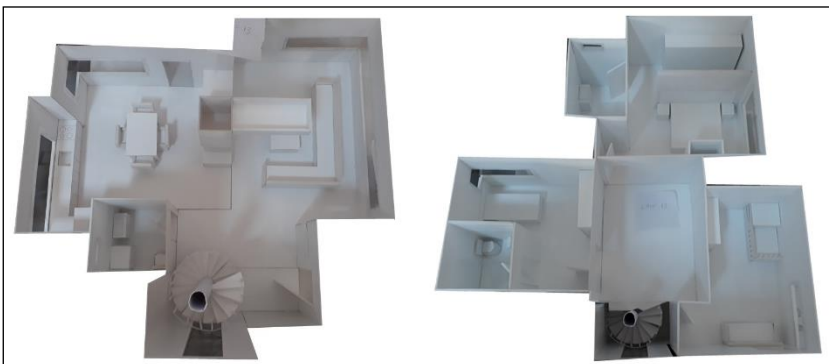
Top views of the example house for a couple with children and babysitter – Ground floor (left) and first floor (right)
